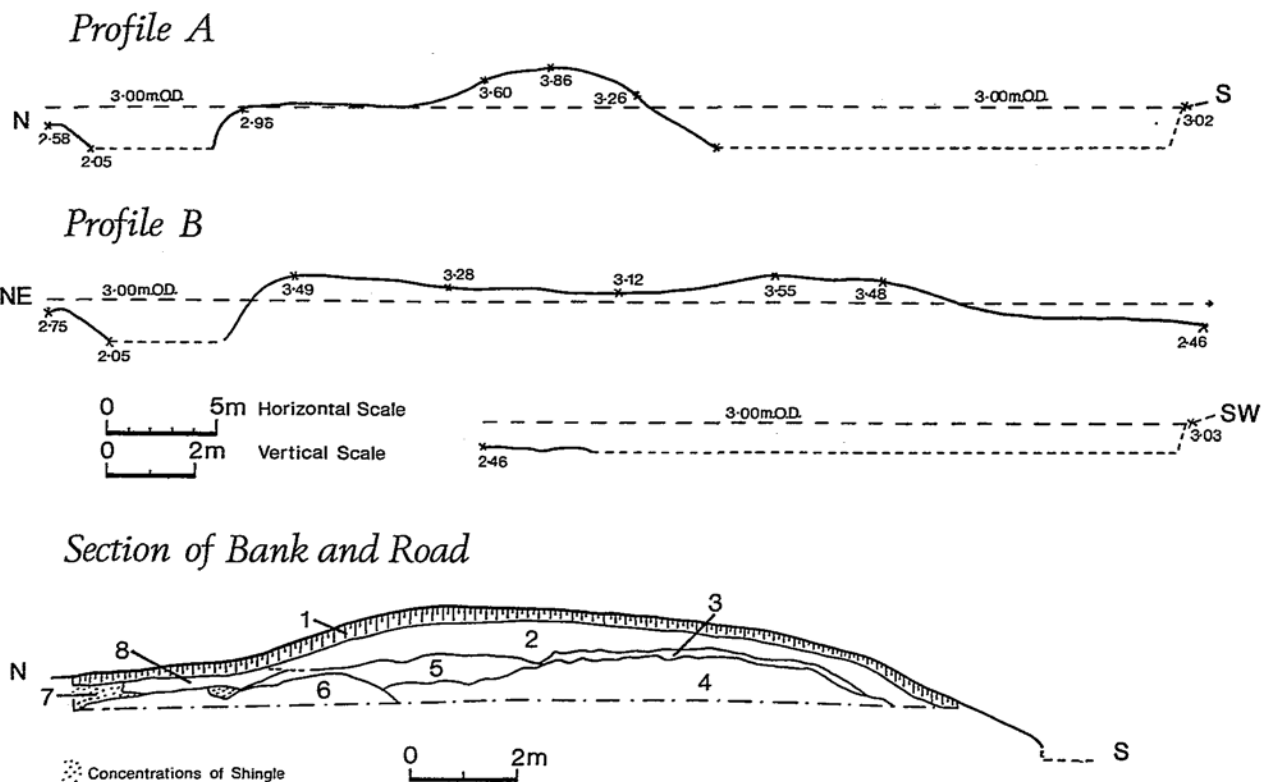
Ham Street, Royal Military Canal – Profiles and Section of Bank and Road.
